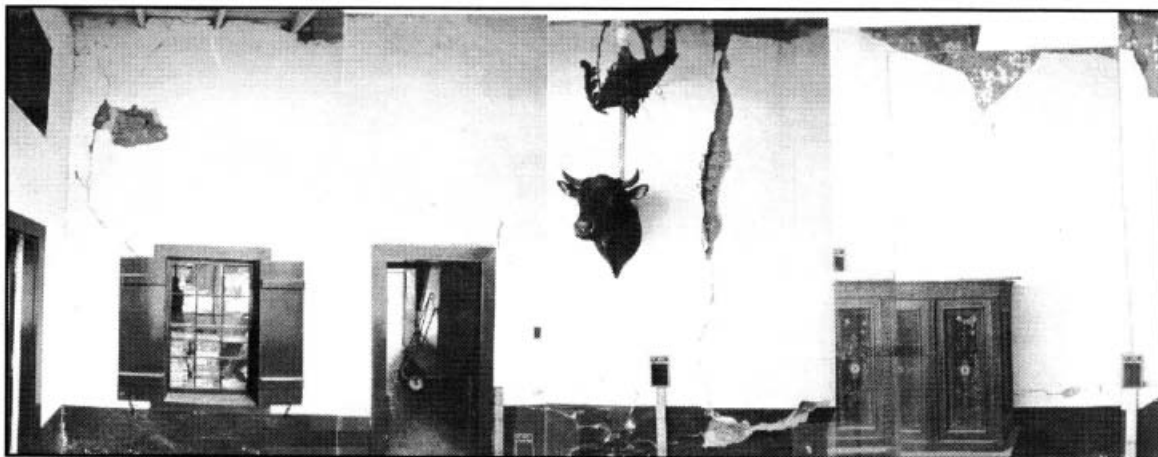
North wall of the south wing. This photograph shows the flexural cracking that has developed vertically at perpendicular walls and along the base of the wall between perpendicular walls. Despite the cracking, the wall is only slightly out of plumb.
